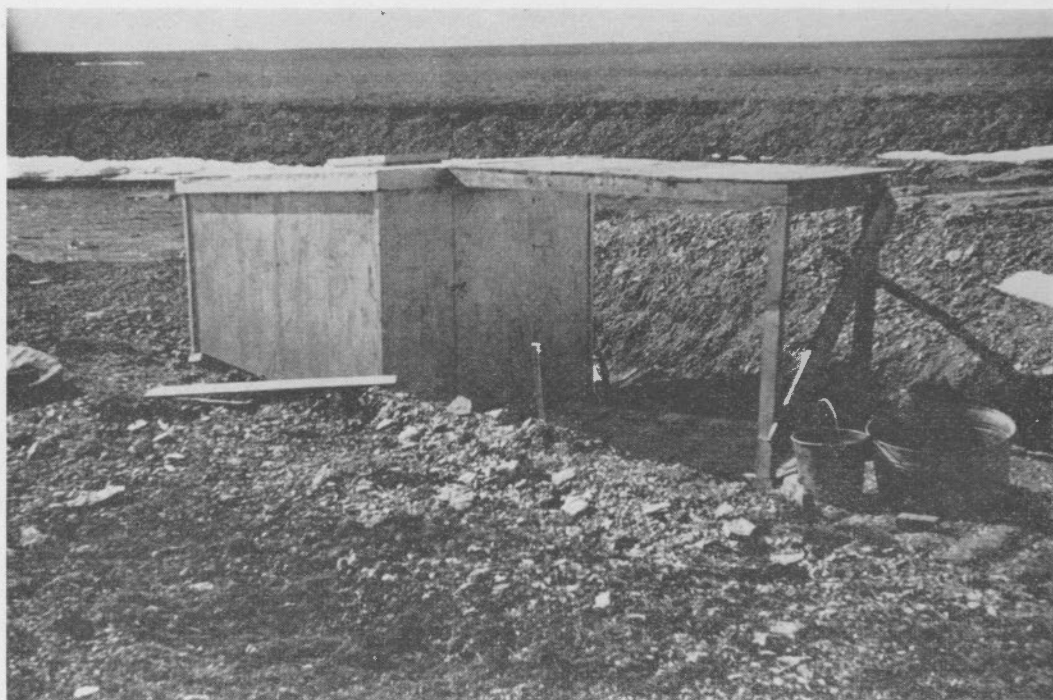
The seismometer shelter during construction. Stairs were later constructed in the section at the right to permit entrance to the vault.
